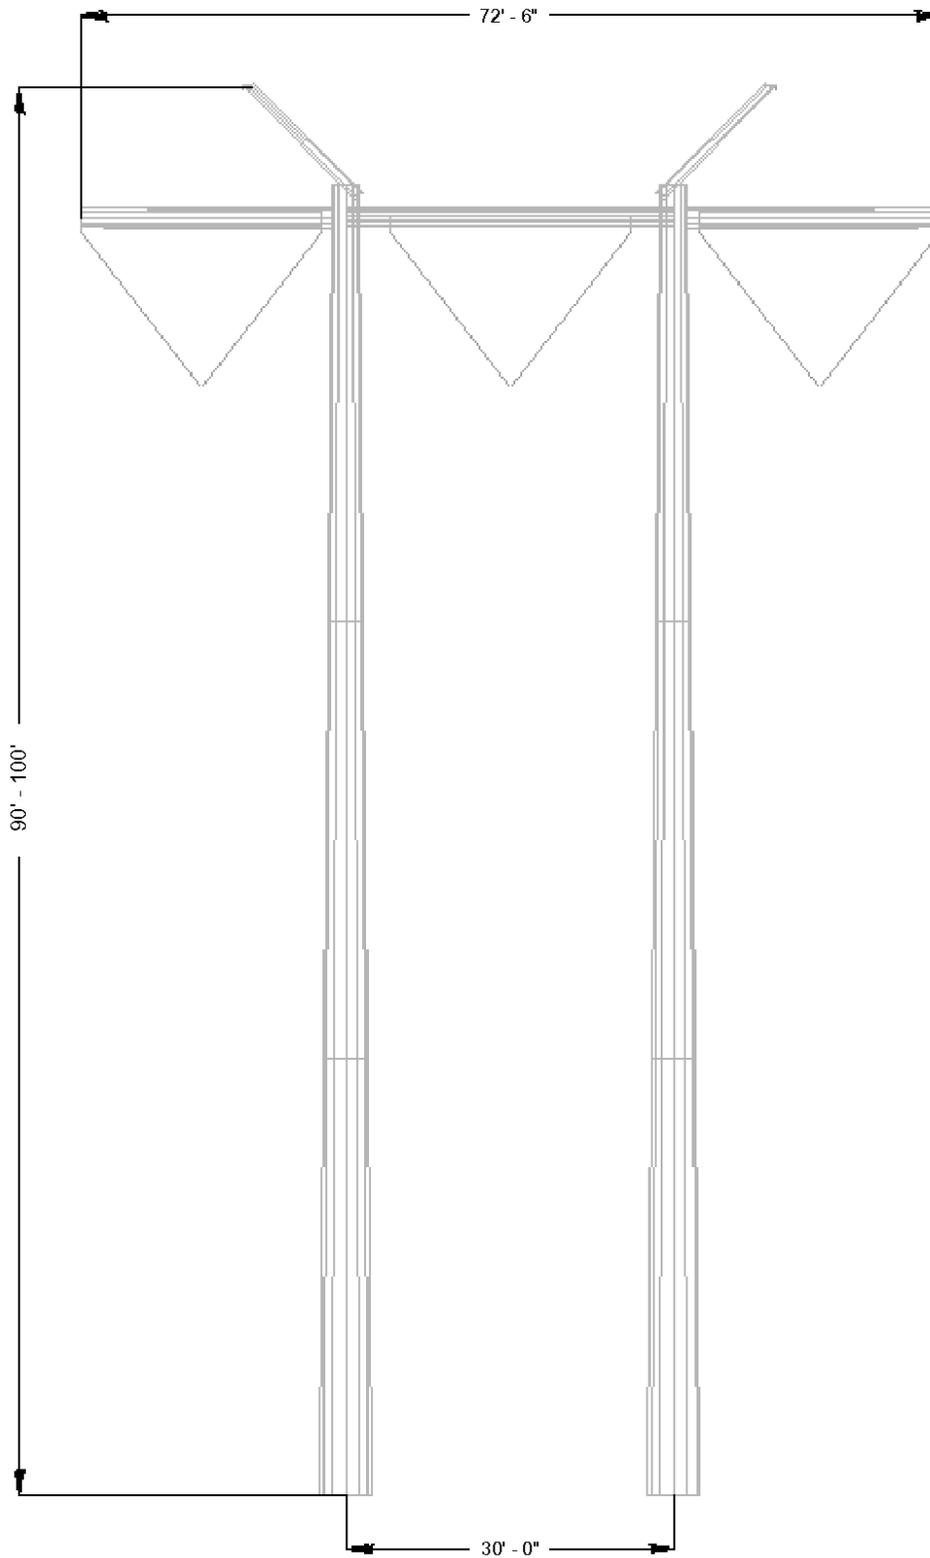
Proposed/Alternative 500-kV Single-Circuit Tubular Steel Pole H-Frame Structure
